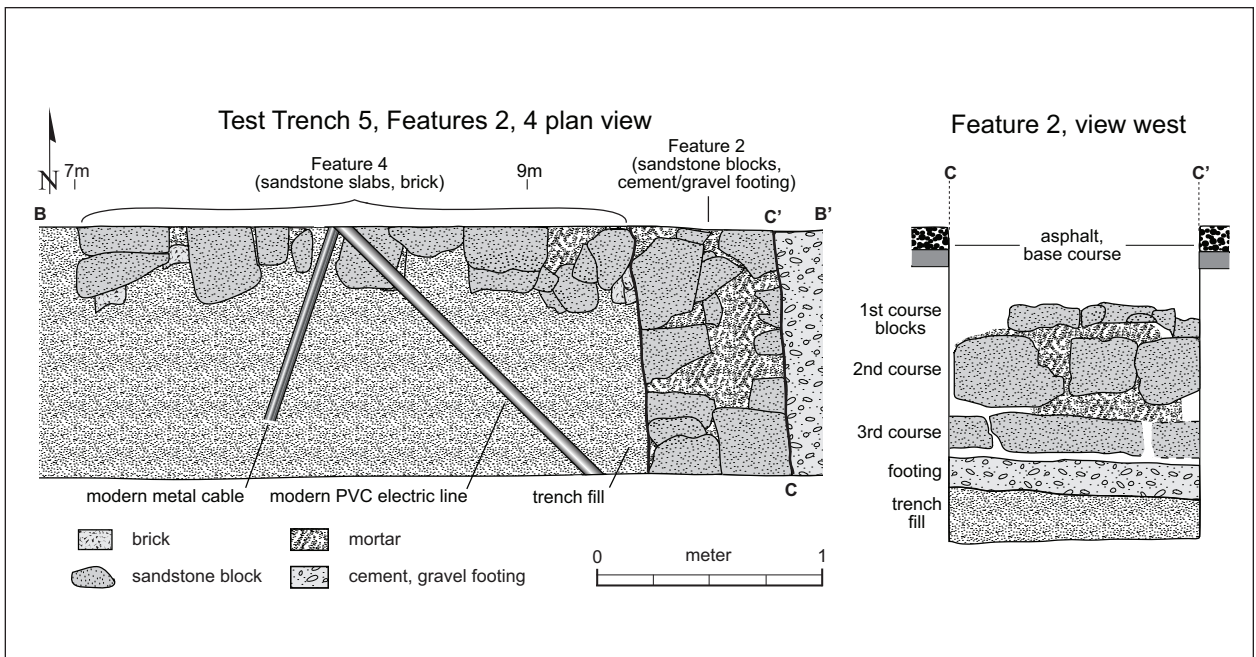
LA 144329, Test Trench 5, Features 2 and 4, plan; Feature 2, foundation, profile.
